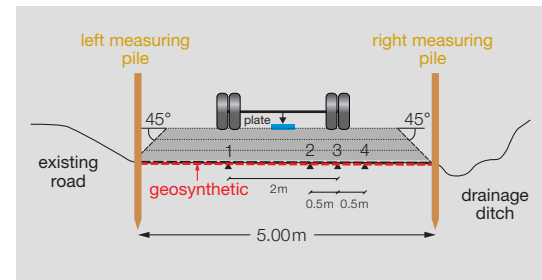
Cross section of the test track with positioning of the transverse strain gauges.
